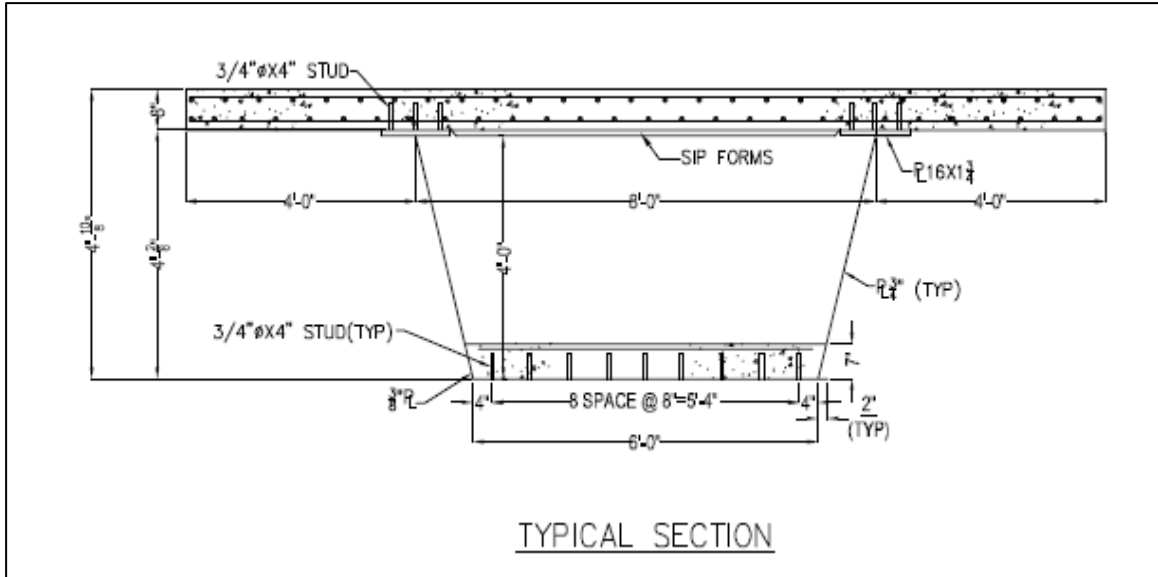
Typical Cross-section of Double Composite Box Girder Test Specimen
